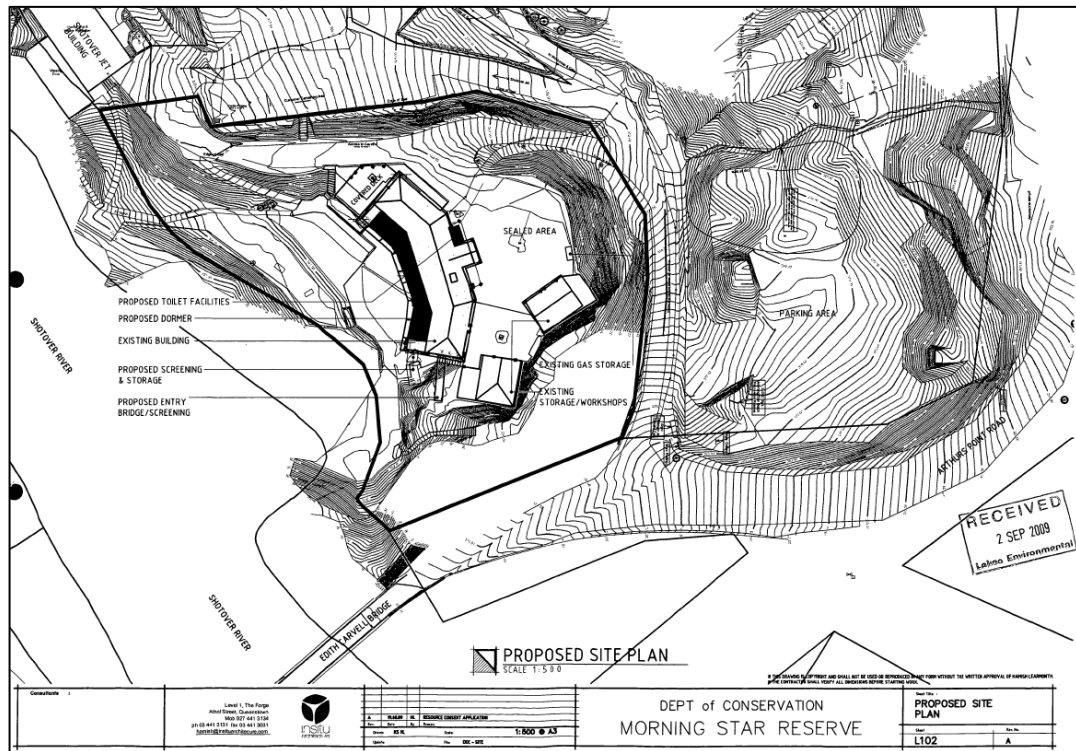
Site plans as submitted in 2009 (Source: RM090648).
